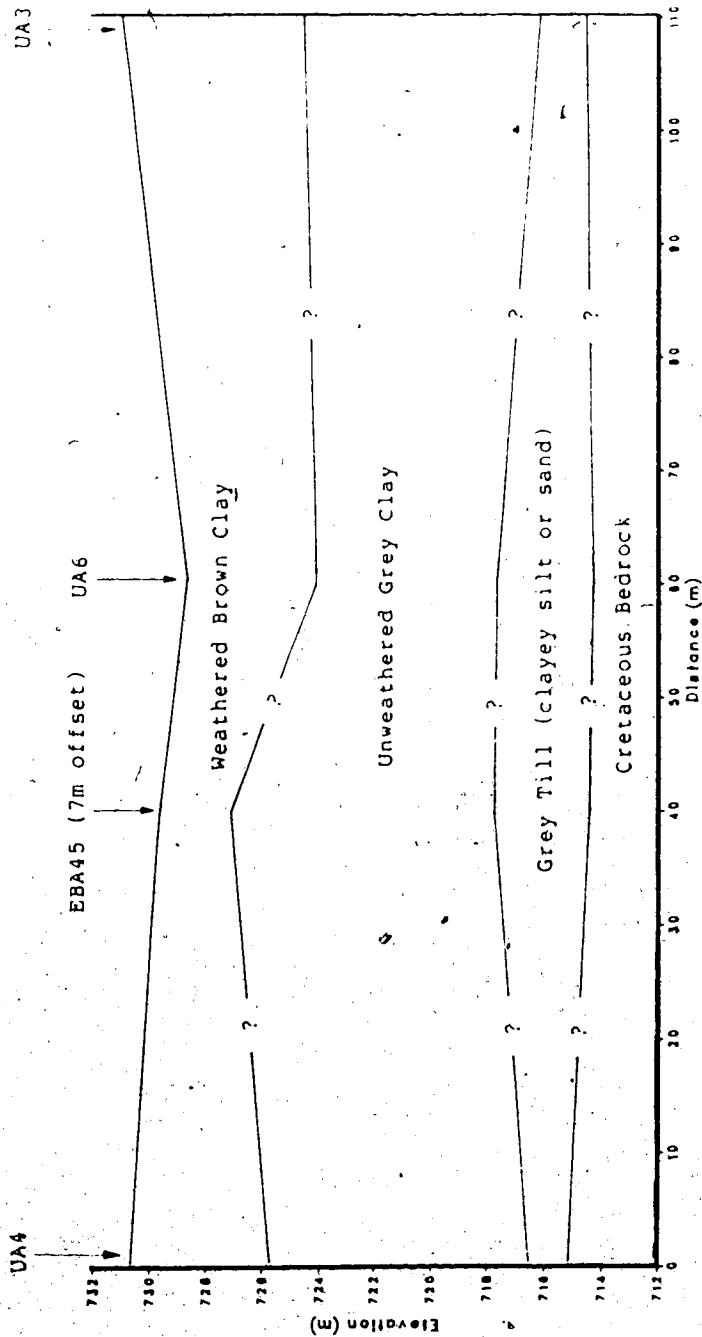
Cross-section Z-Z (refer to Plate 2.2 for location).
